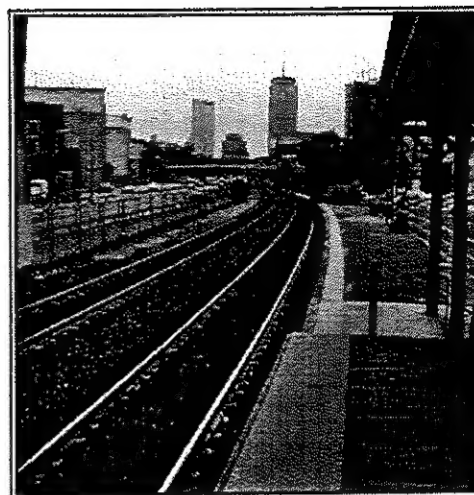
View from existing Yawkey Station looking East towards Boston.
